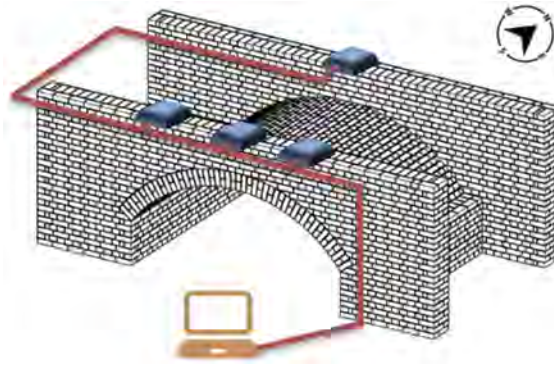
Accelerometer instrumentation for ambient vibration test on the masonry arch bridge (note: backfill is not shown here for simplicity).
